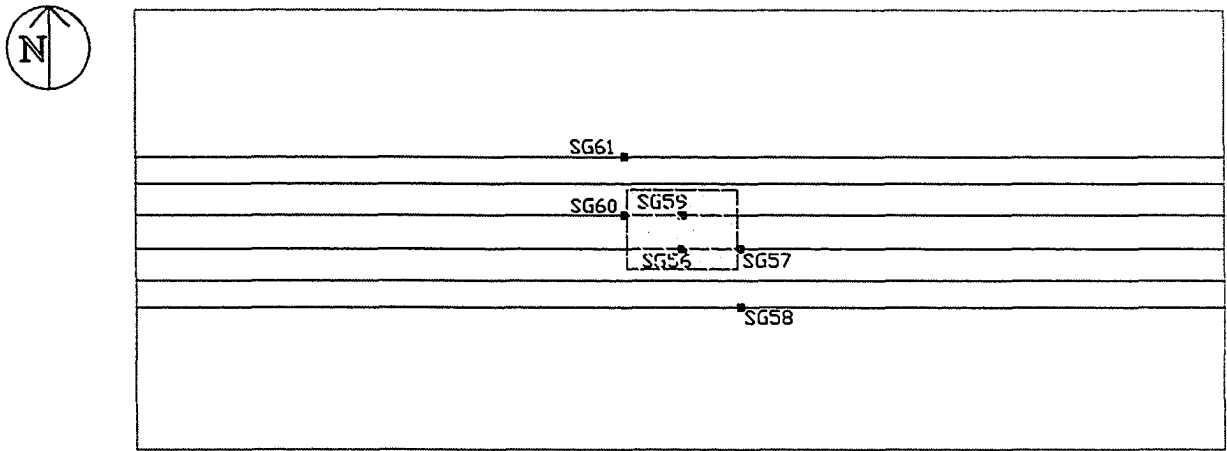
Location of Strain Gages on Beam Top Rebars (Group D)
